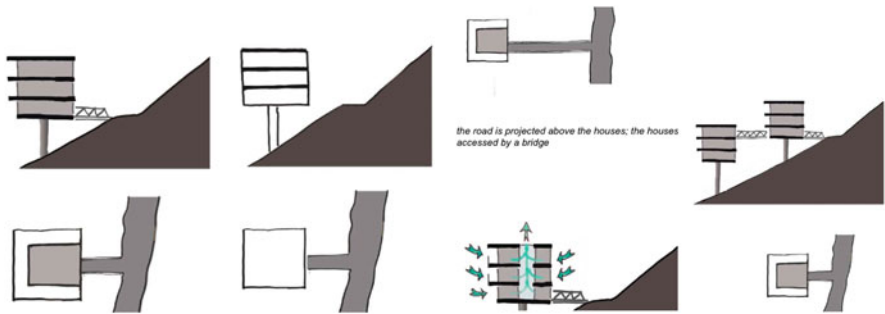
The house designed like a tree in the landscape, connected by a bridge and ventilated through the chimney effect (Yu et al. 2008b)
